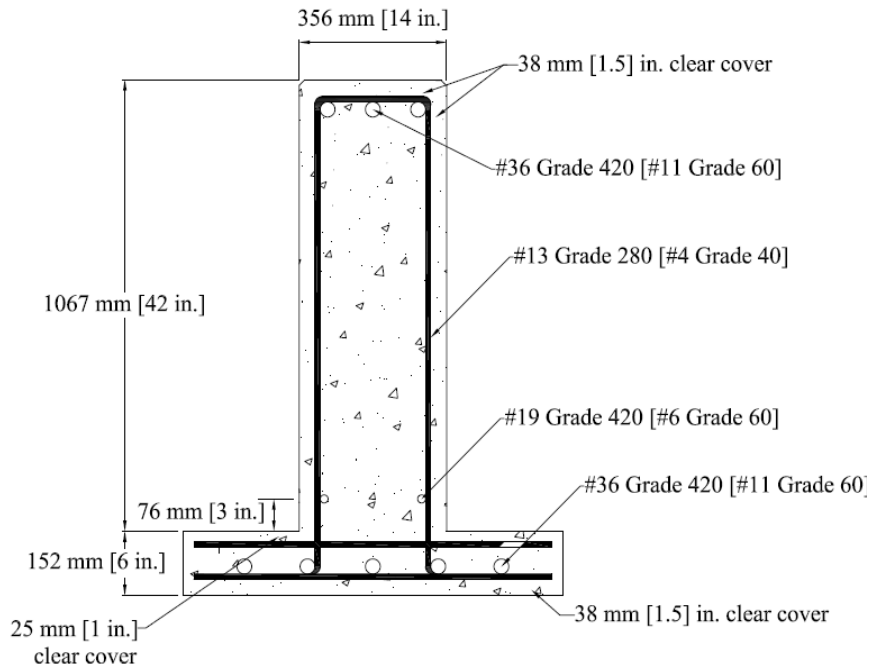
Typical cross-section with 5 flexural reinforcing bars
